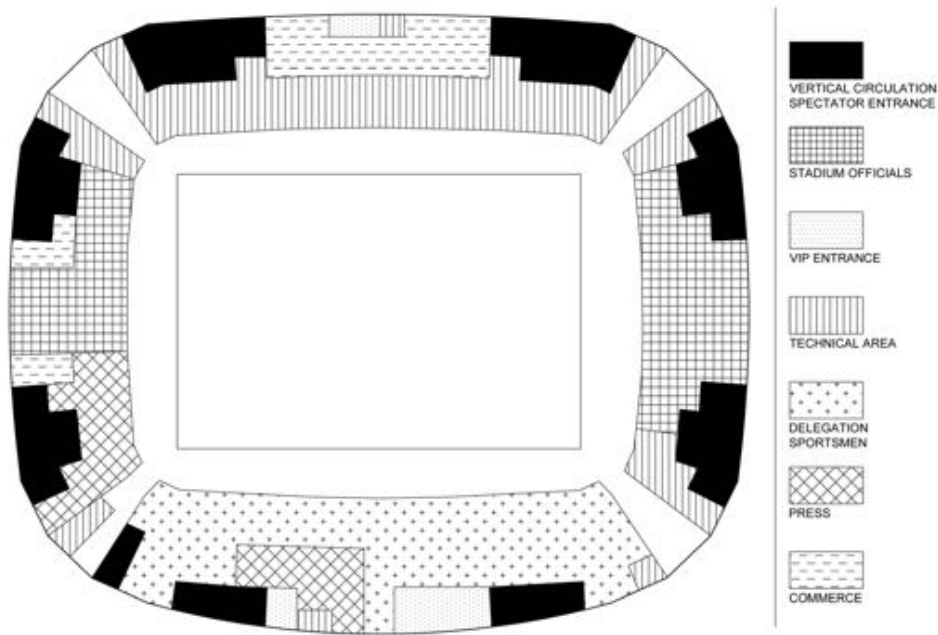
Example ground floor plan; Konya Metropolitan Stadium.
